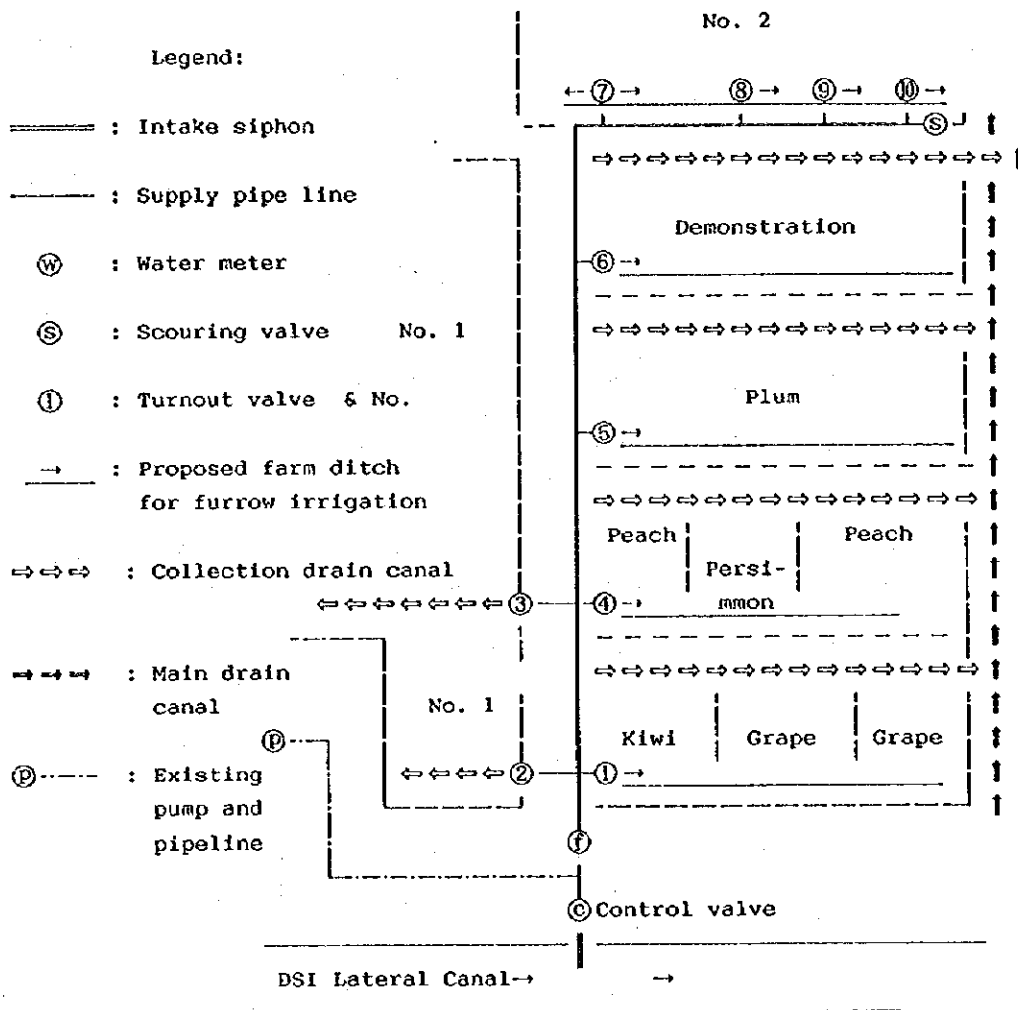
Schematic plan of surface irrigation system for orchard, No.1 and No.2 areas
